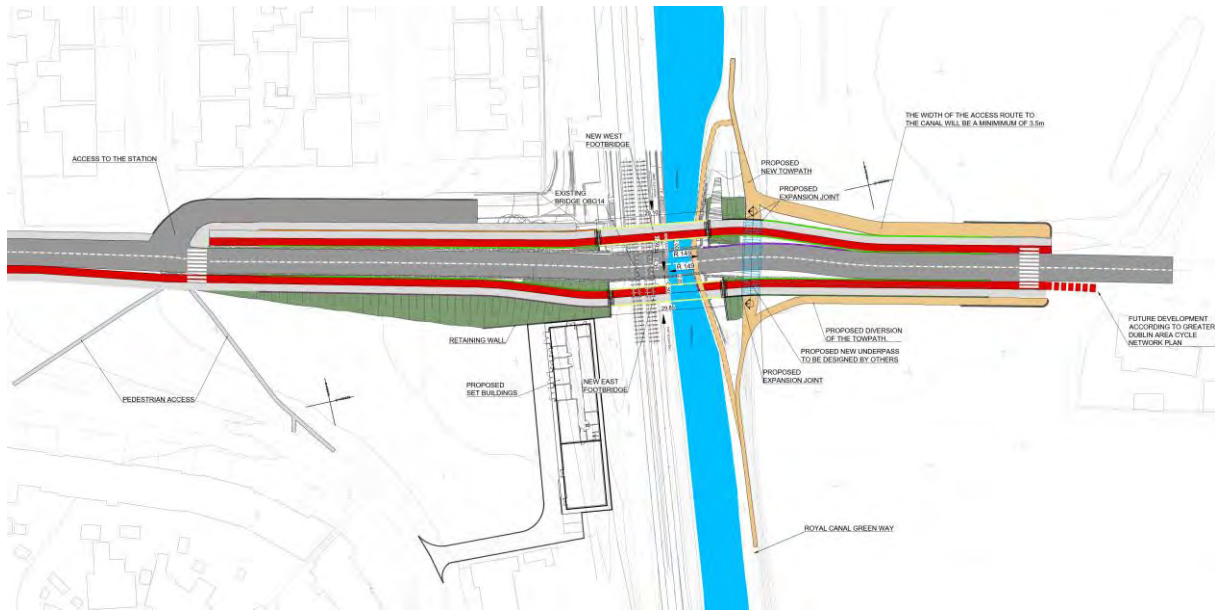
Plan view of revised OBG14 Cope Bridge layout
